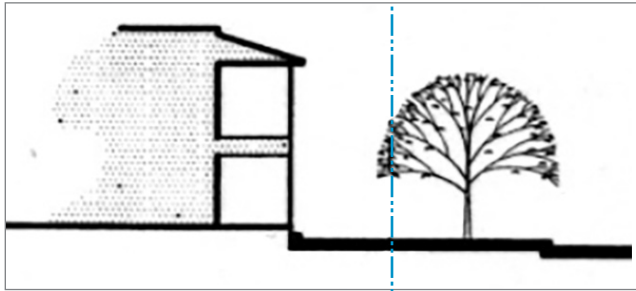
Porch. A covered but unenclosed structure projecting from the outside wall of a building. A great variety of porches are possible, but to be useful, none should be less than 8 ft. wide.
